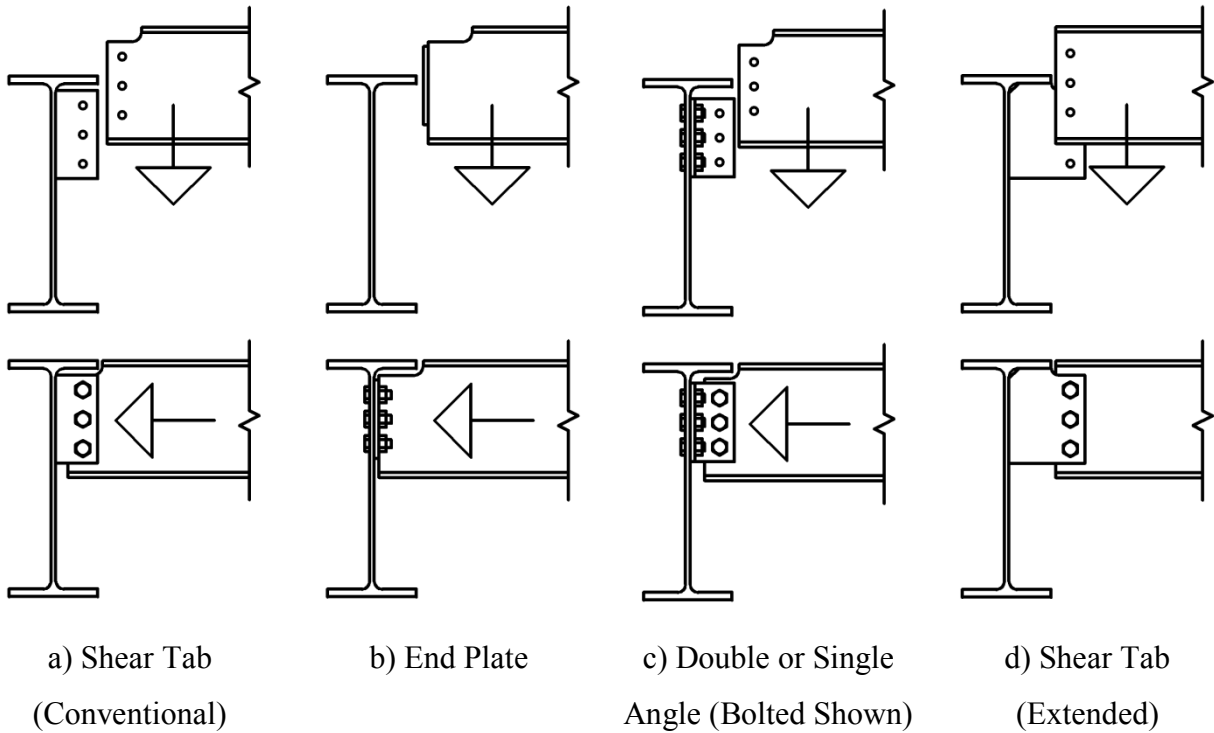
Comparison of Installation Method for Beam-to-Girder Shear Connections
